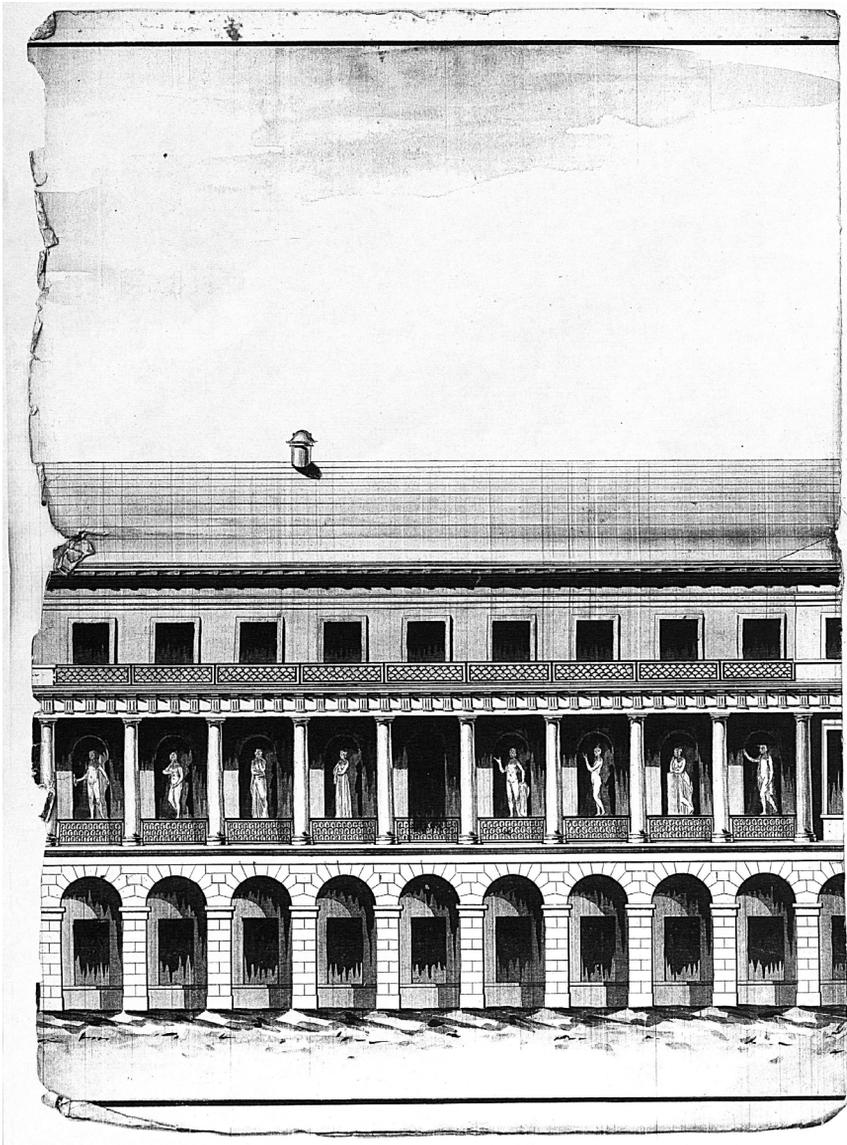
Building Plans for the New Müller-Deym Art Gallery at Rotenturmtor, signed Joh. Aman, 1796, located at the Vienna City Archive (A-Wsa, Unterkammeramt. Baukonsense A 5241/1801).
